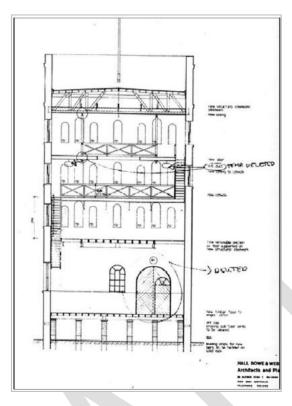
1982 section through the original, 1860s wing of the building showing the proposed works to create the main auditorium. It was proposed to remove the first gallery and open up the space with catwalks proposed for the eastern wall. The second floor gallery was retained, supported by structural steel framing and replaced the original timber post and beam system. (Source: City of Sydney Archives 539/1/82)
